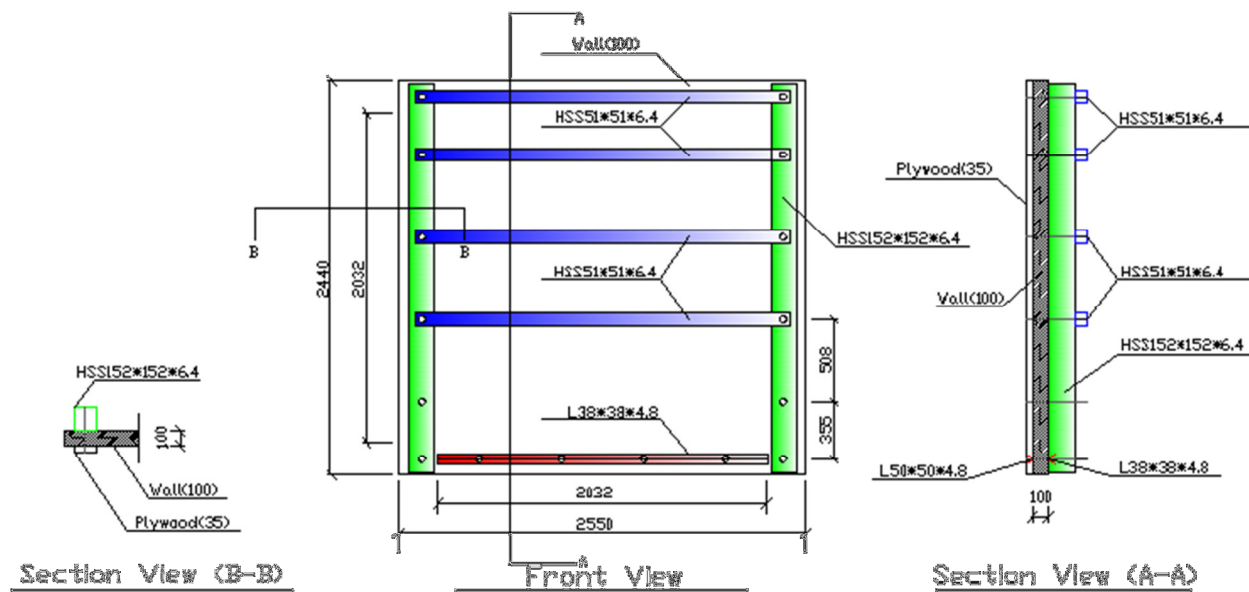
Boundary condition for Wall 1 (all dimensions in mm)
